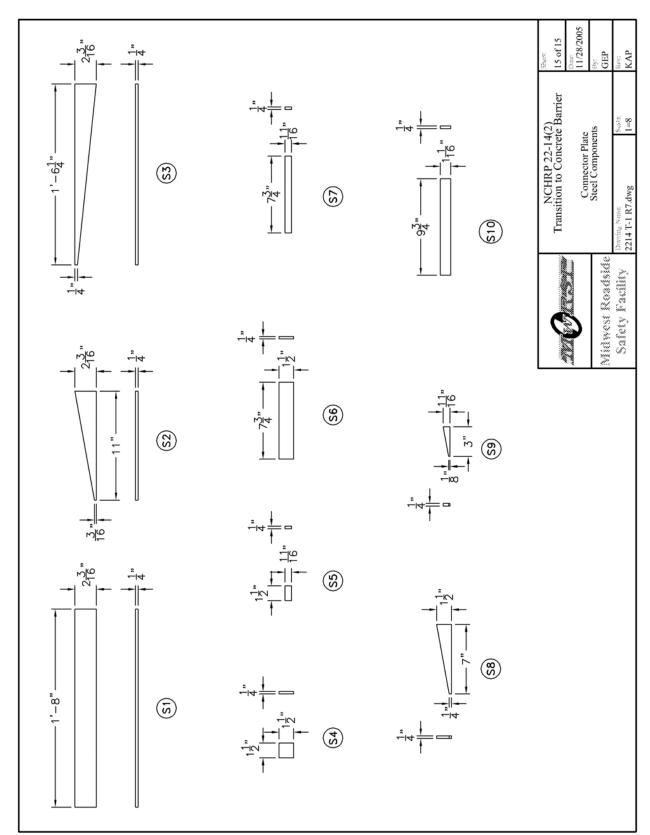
Approach Guardrail Transition to Concrete Barrier Design - Connector Plate Details (English)
